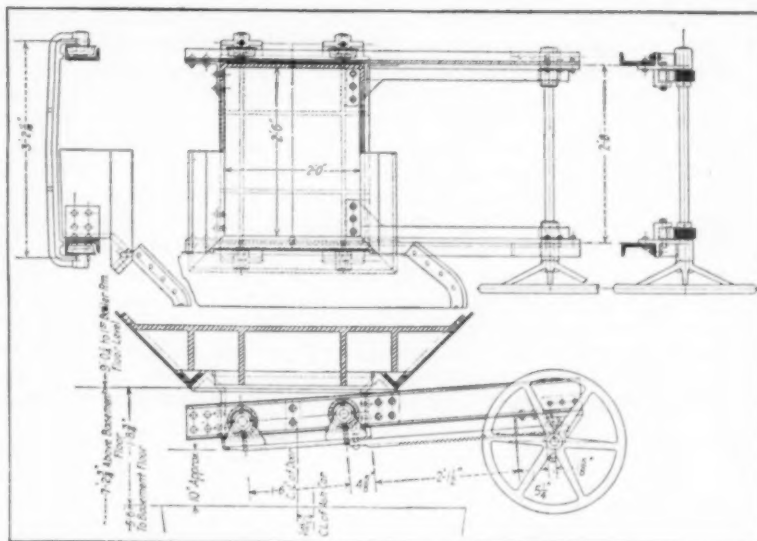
ASSEMBLY OF ASHPIT DOOR AND FRAME
